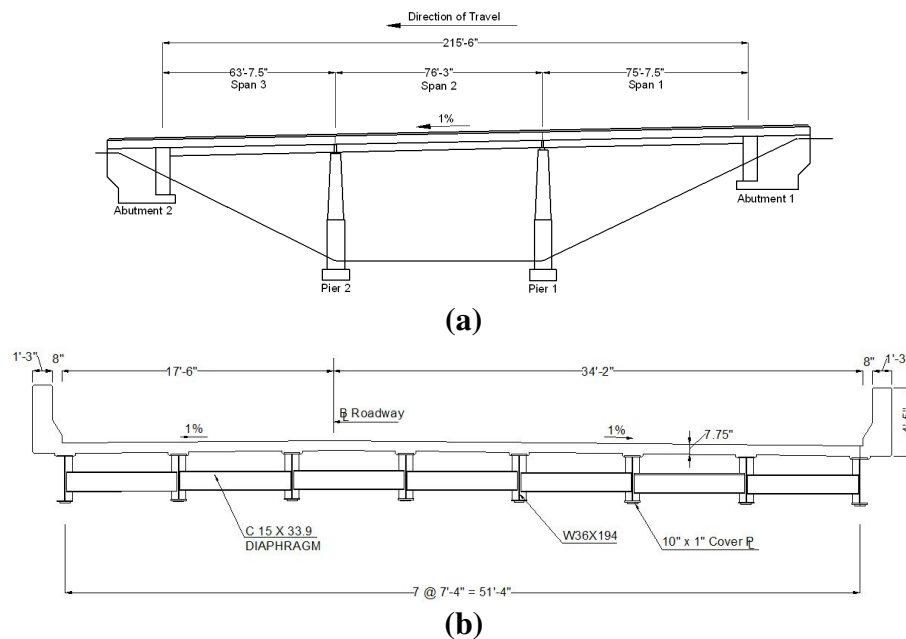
Elevation (a) and Cross Section (b) of the Composite Steel Girder Bridge.
